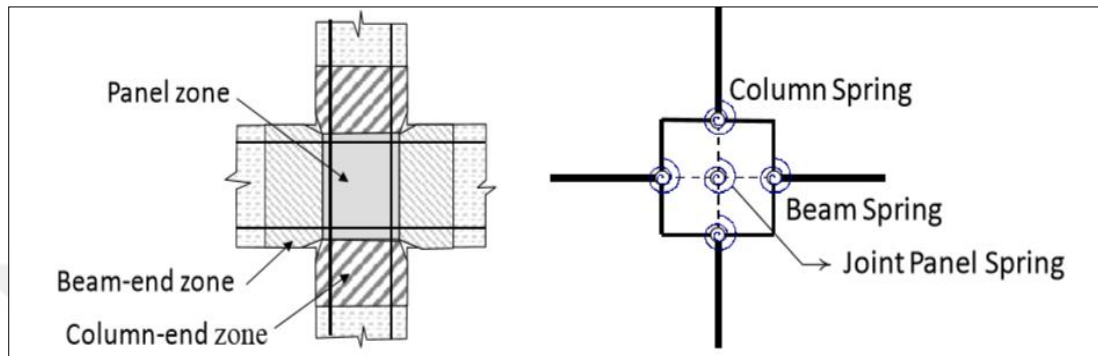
RC beam-column joint modeling (ATC-72-1/2010).
